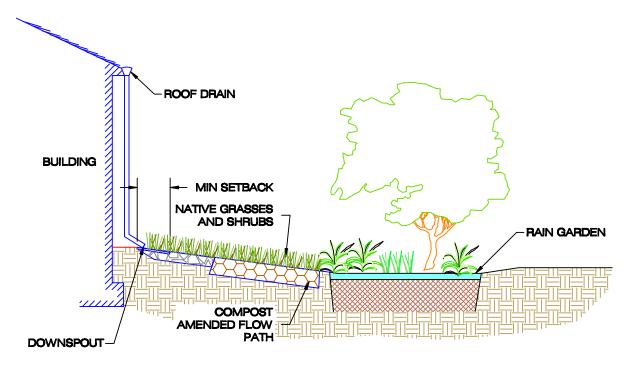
Rooftop Disconnection – Section View: Simple disconnection to downstream bioretention (Source: VADCR, 2011).
